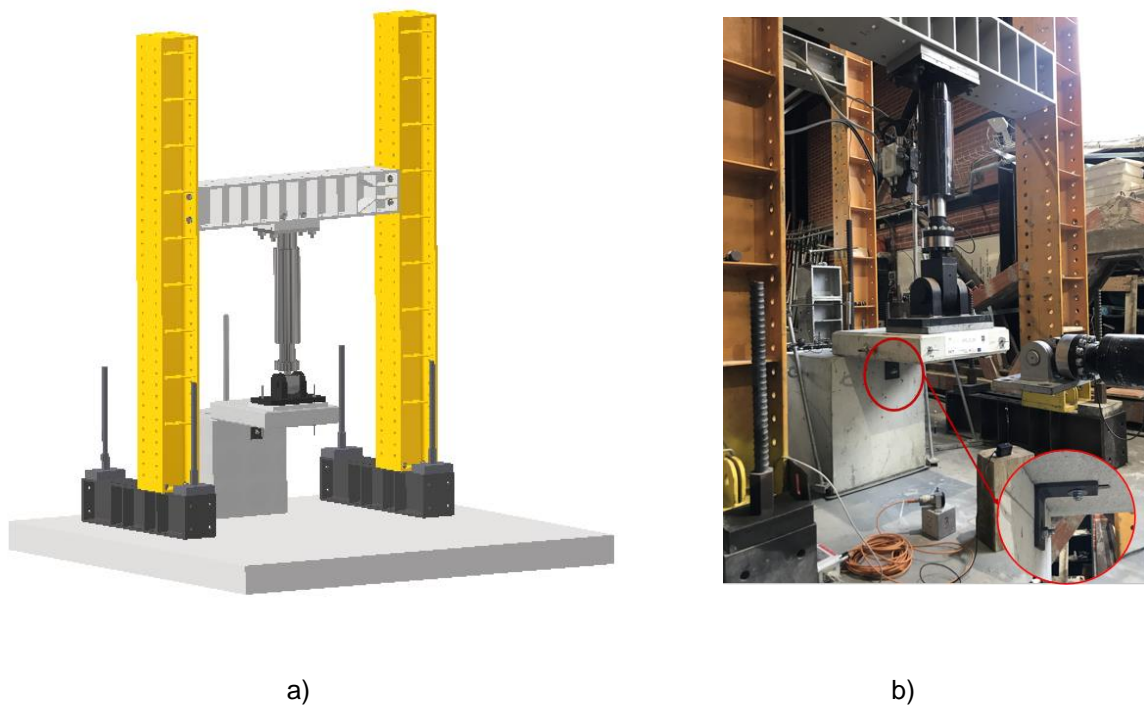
Schematic testing of the cladding-to-column connection out-of-plane: a) Test scheme; b) General view.
